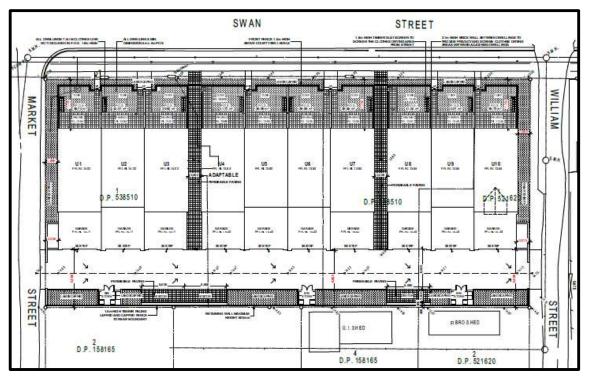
Proposed development layout (Sorensen Design, 2021)
